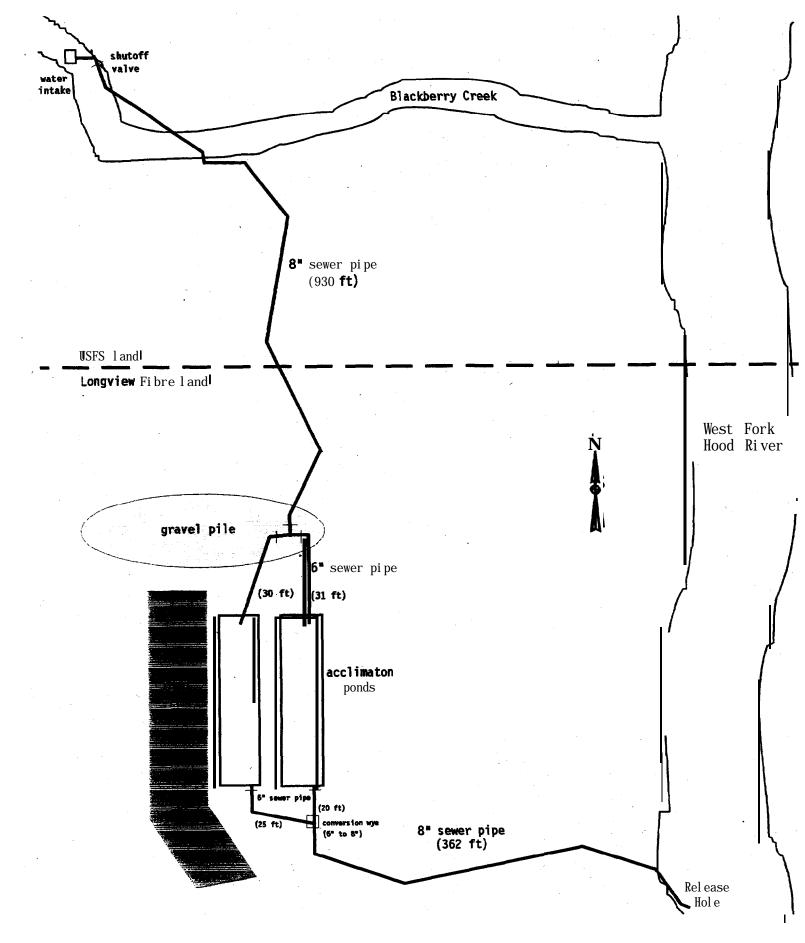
Schematic of the West Fork Hood River acclimation site (Rm 9.0) located near Dry Run bridge.
